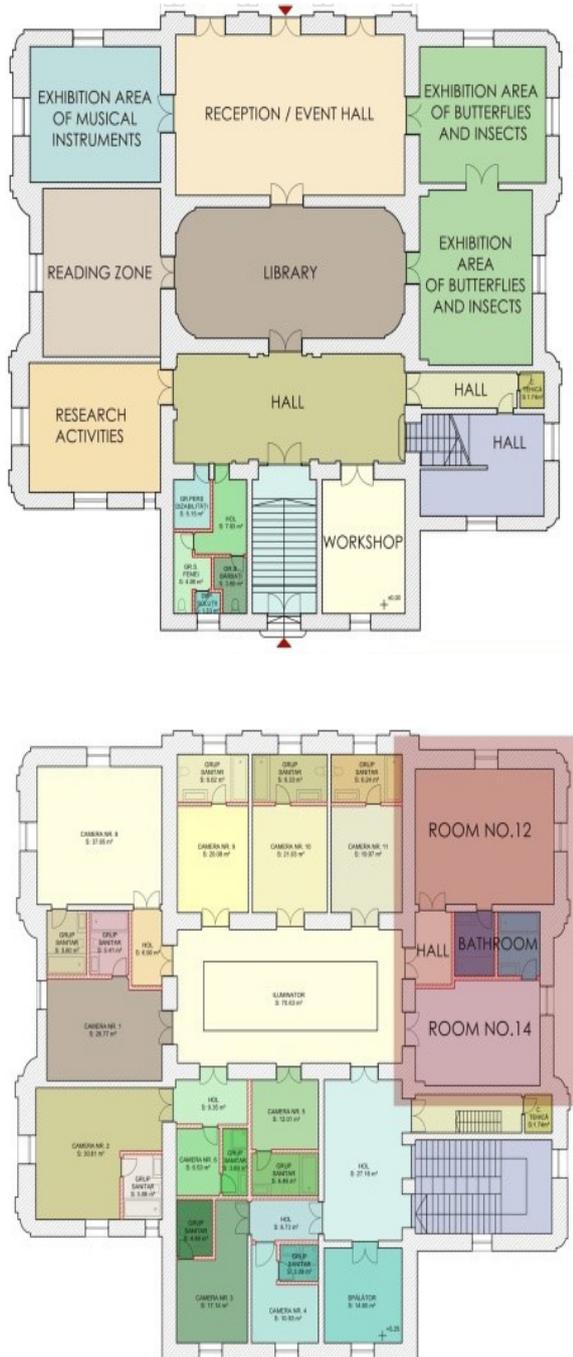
Partitioning plan – Ground floor and 1st Floor
